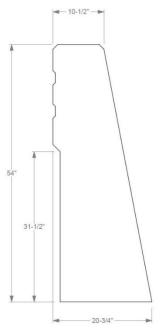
54-Inch Tall Single Slope Barrier Profile.
